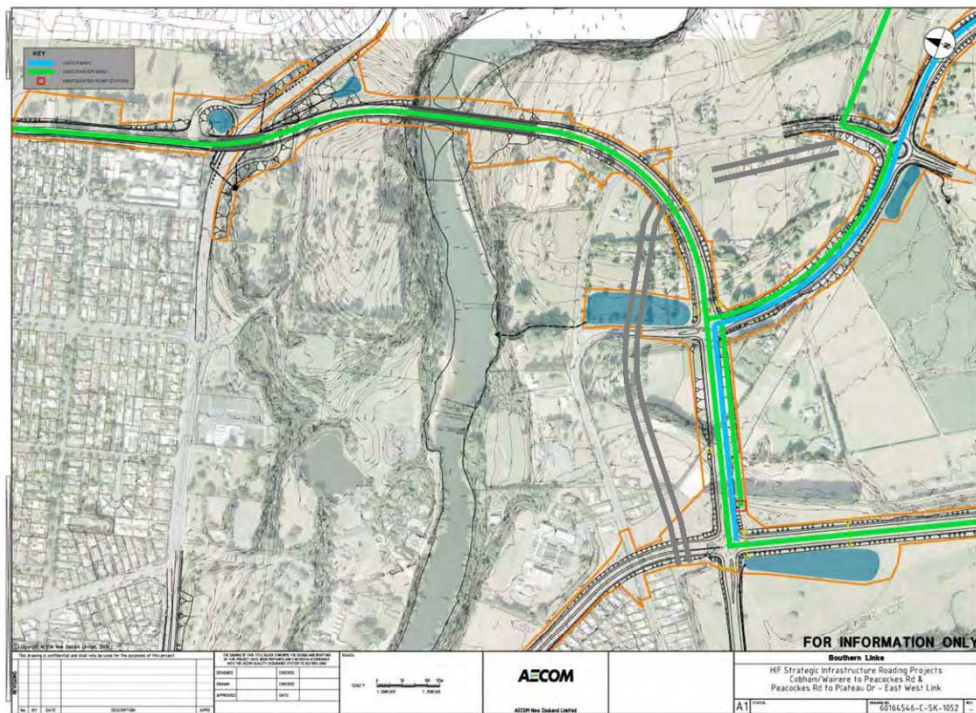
Cobham interchange, Hamilton Gardens bridge and road connections
